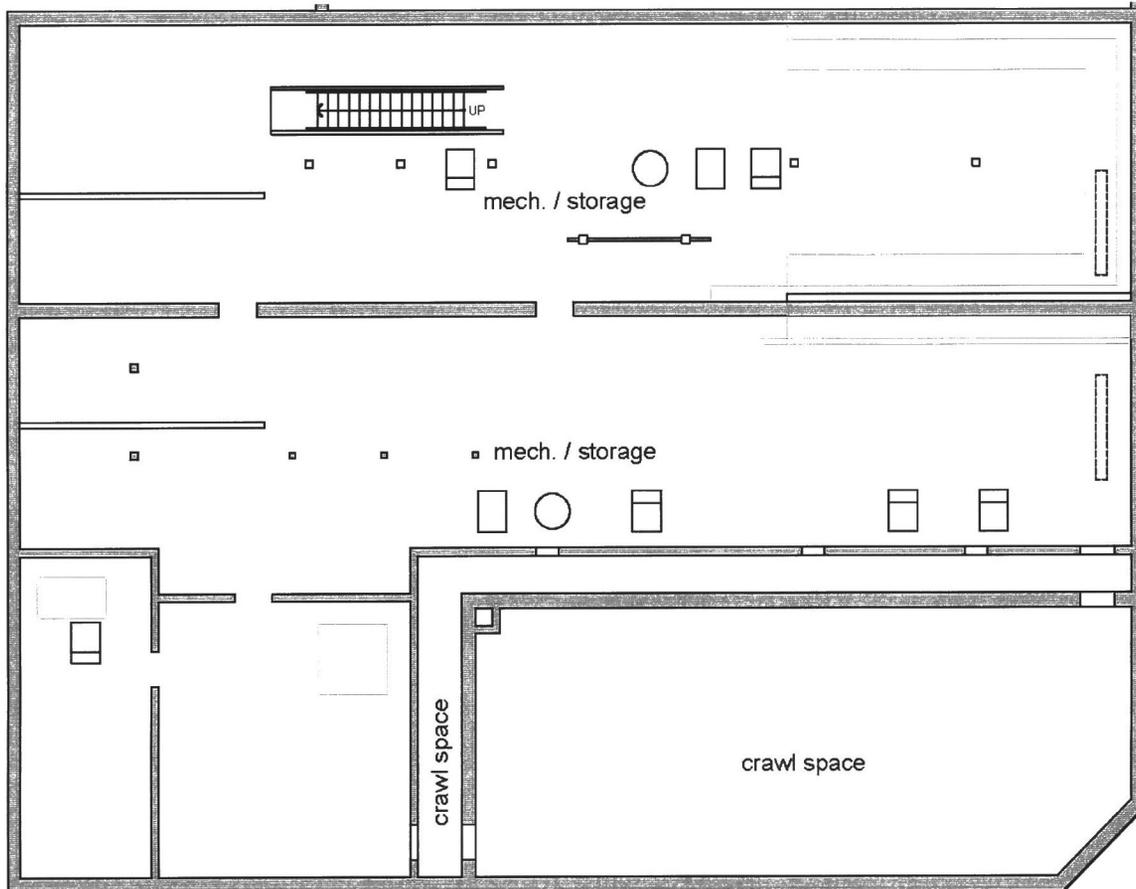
Basement Floor Plan Post-Rehabilitation Lots 13-15 – Plan by APMA March 2011 – not to scale.
